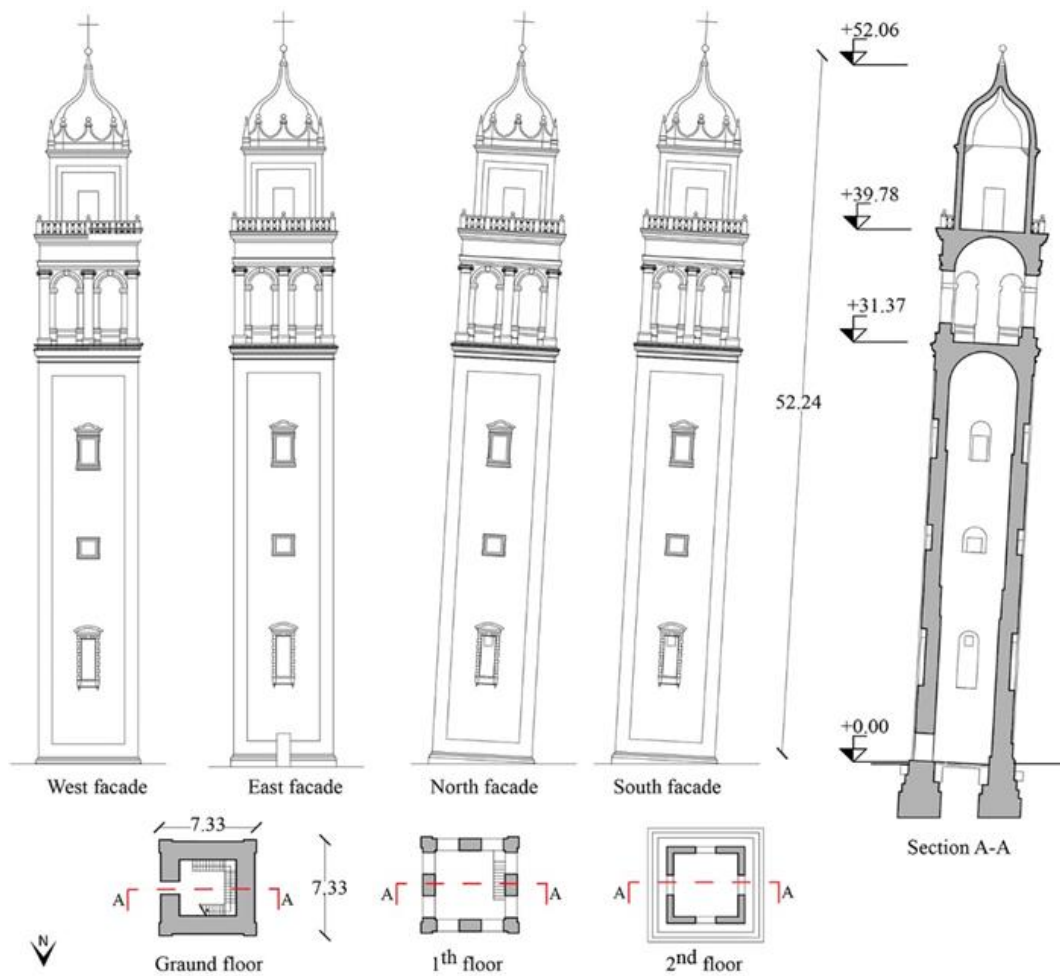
Geometrical configuration of San Benedetto church tower in Ferrara
